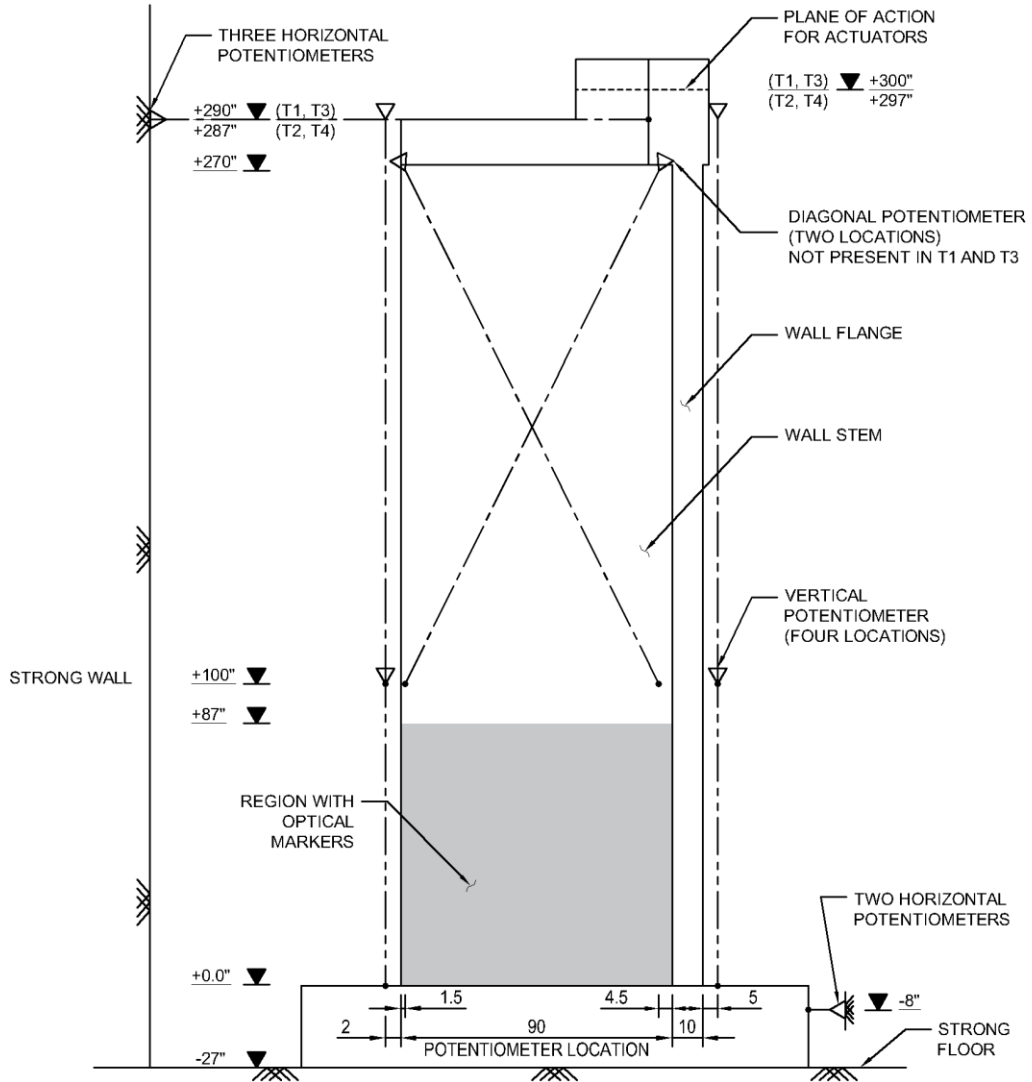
Wall instrumentation (elevation view of wall stem) (1 in. = 25.4 mm)
